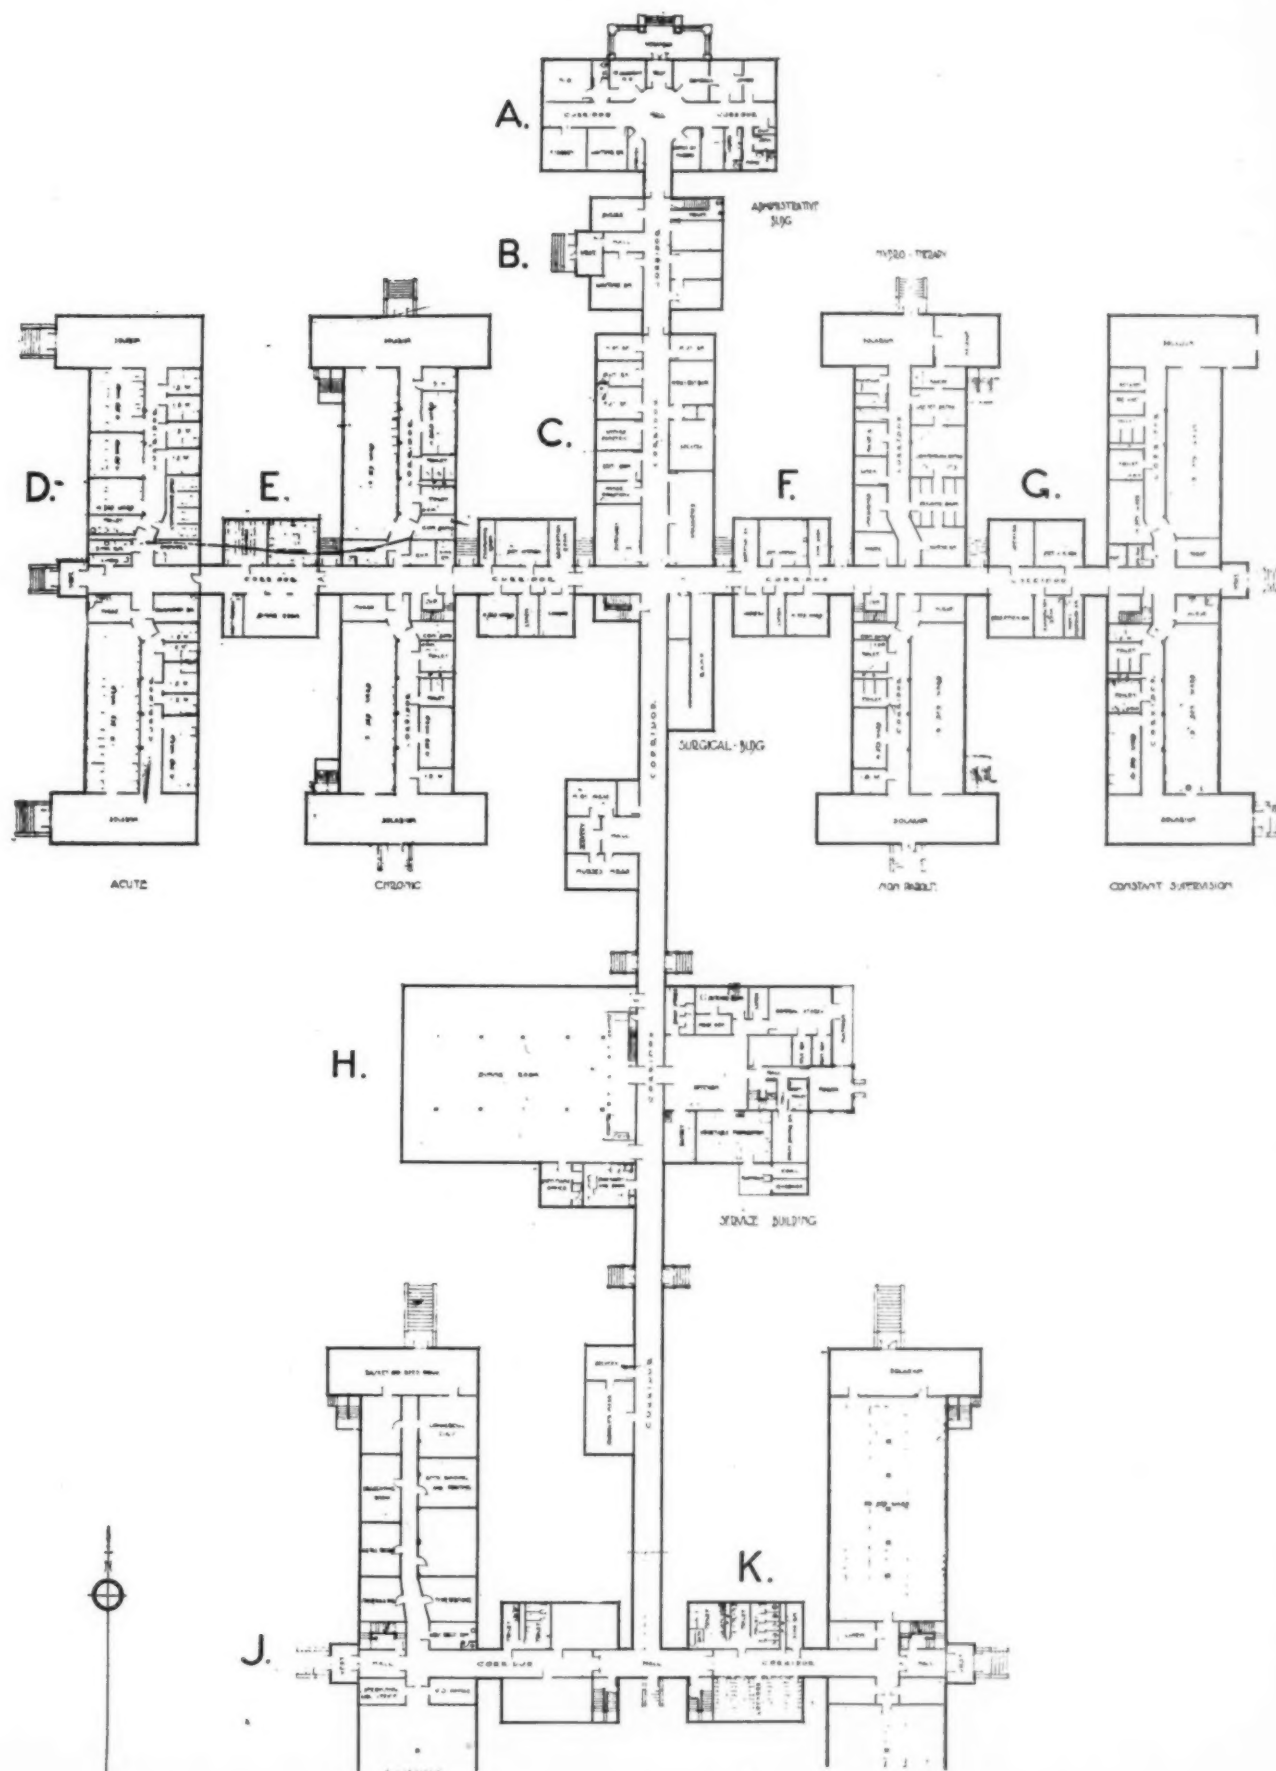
First floor plan of the Psychopathic Hospital, London, Ontario, Canada.
